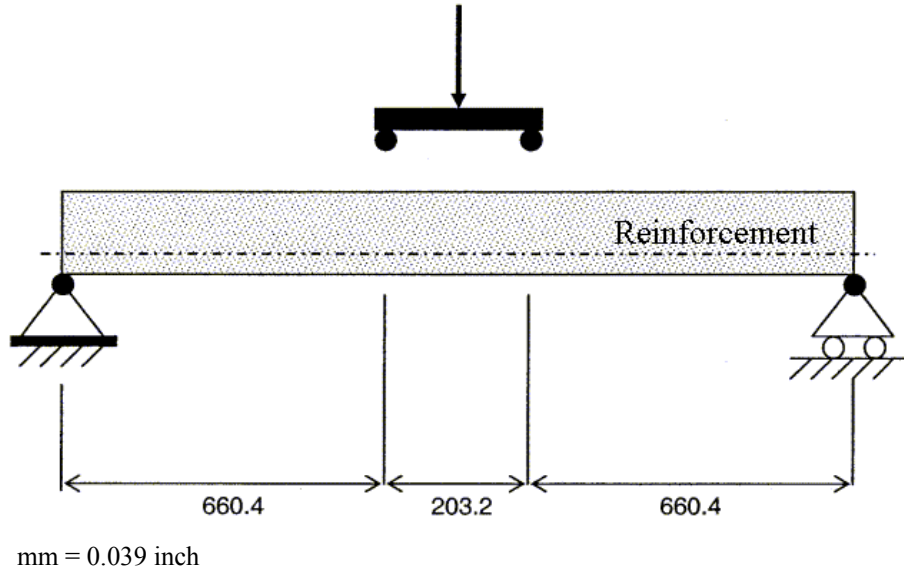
Sketch of four-point bend tests, showing dimensions in millimeters.<sup>(10)</sup>
